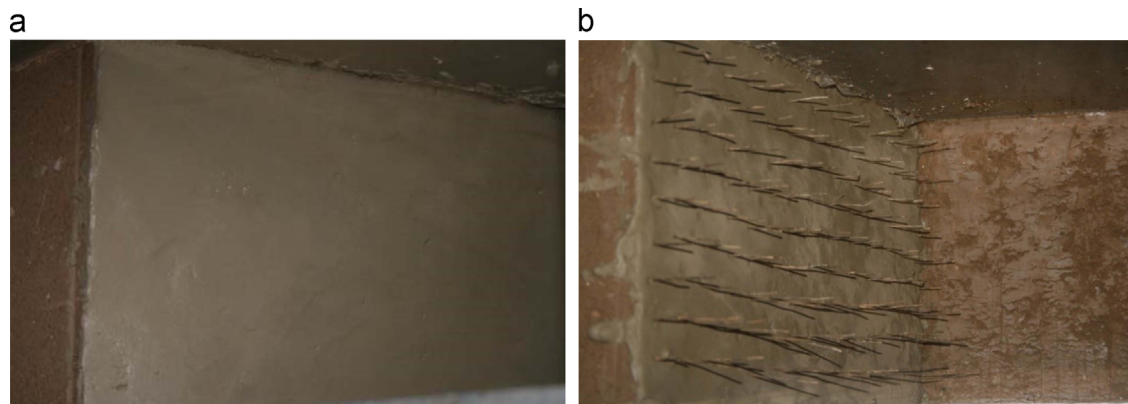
Precasting of soil nail wall before tests. (a) Cement layer on the slope; (b) nails.
